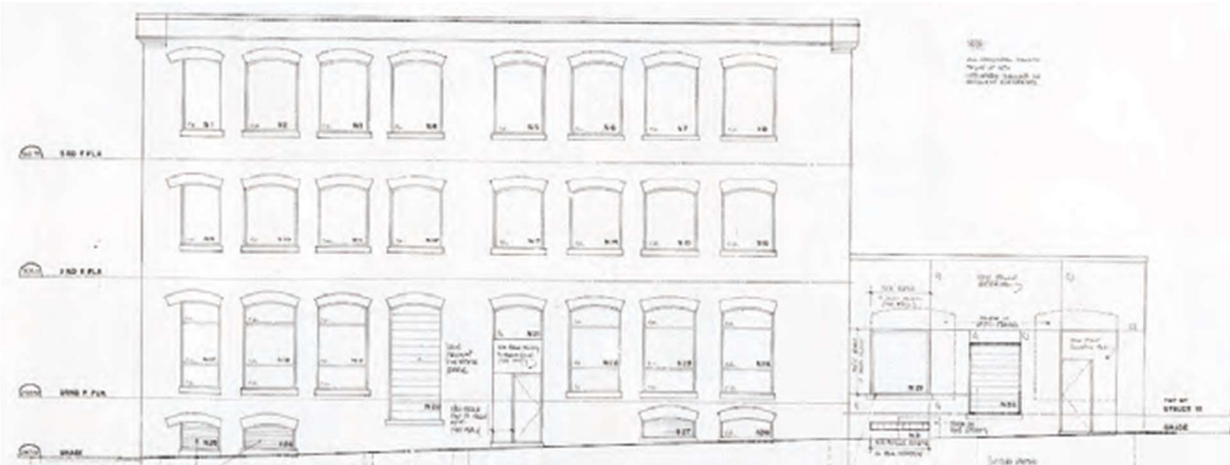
1990 building permit drawings, north elevation (Toronto Building Records).
